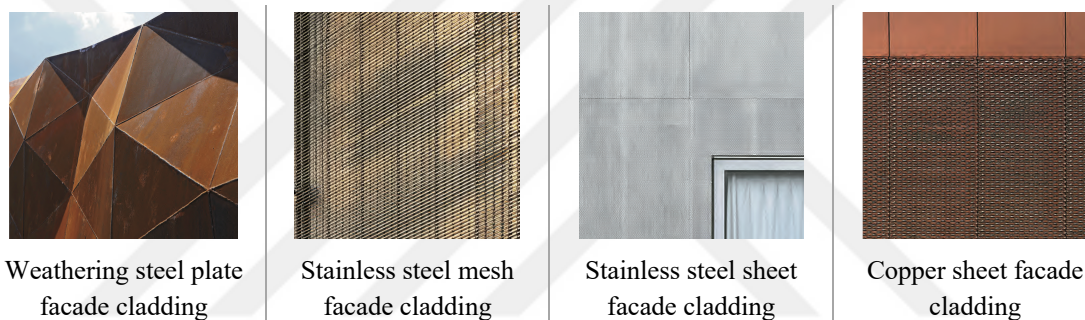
Metal facade cladding examples (Schittich, 2012)
